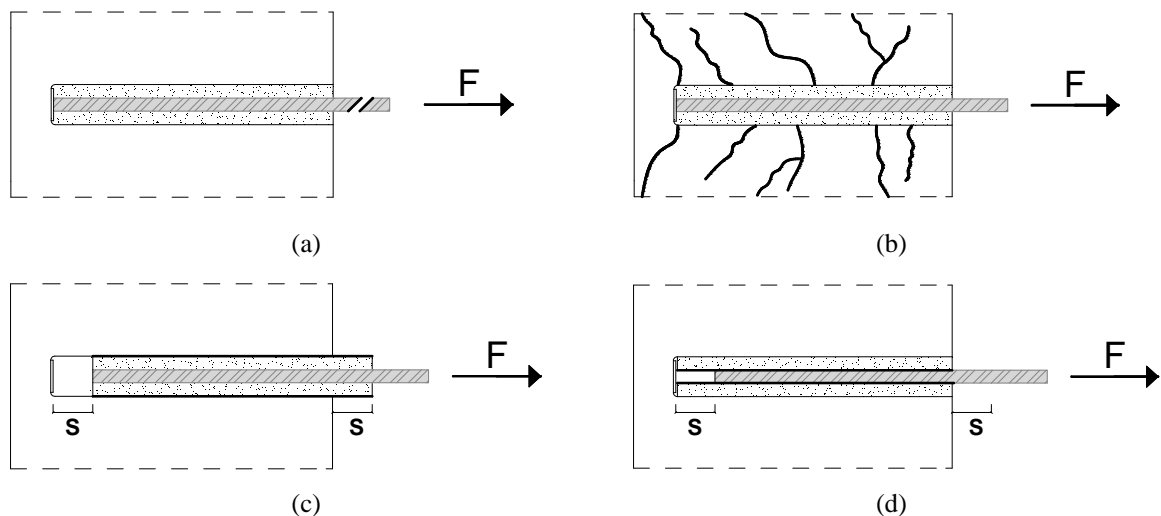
Possible failure mechanisms in anchoring systems: (a) Steel failure; (b) Masonry cone failure; (c) Sliding failure along the outer interface; (d) Sliding failure along the inner interface (adapted from Algeri et al. 2010).
